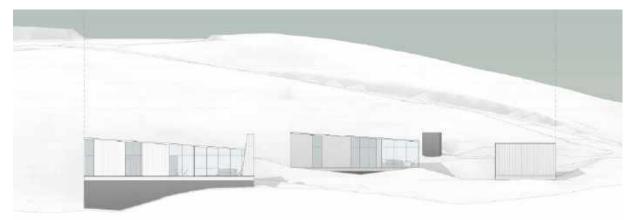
Chalet Buildings Elevation. TOA Architects Ltd.
